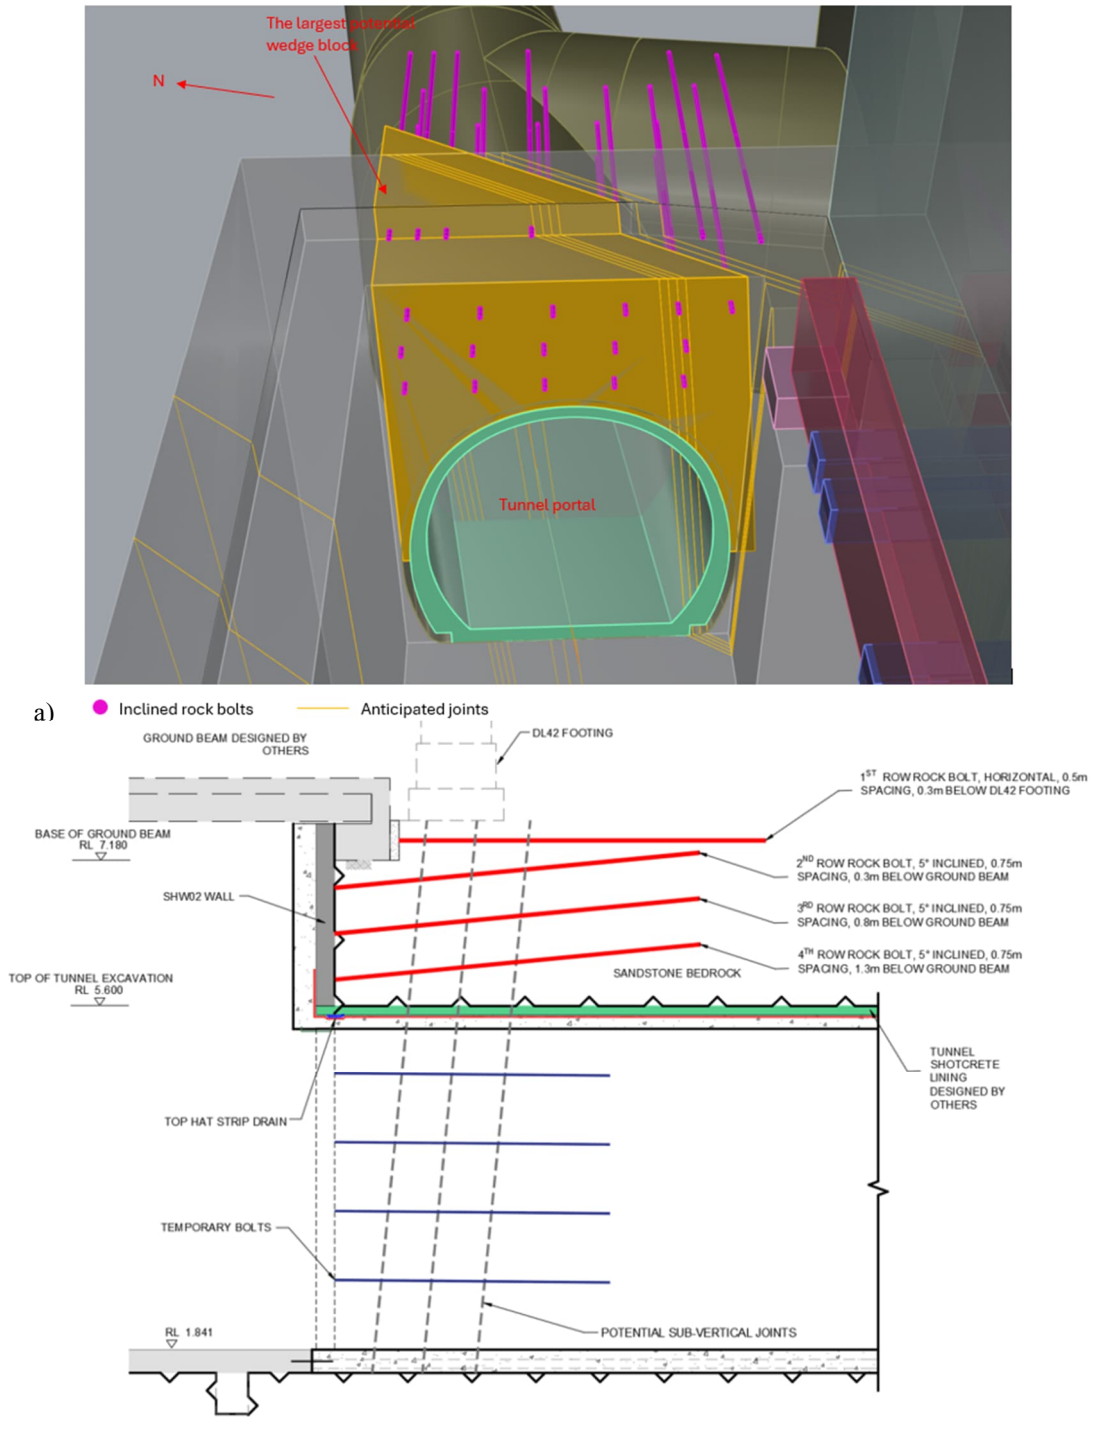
(a) Tunnel portal design model (NB – 3D image of the portal, jointing, and bolts) and (b) bolt layout along the tunnel profile
